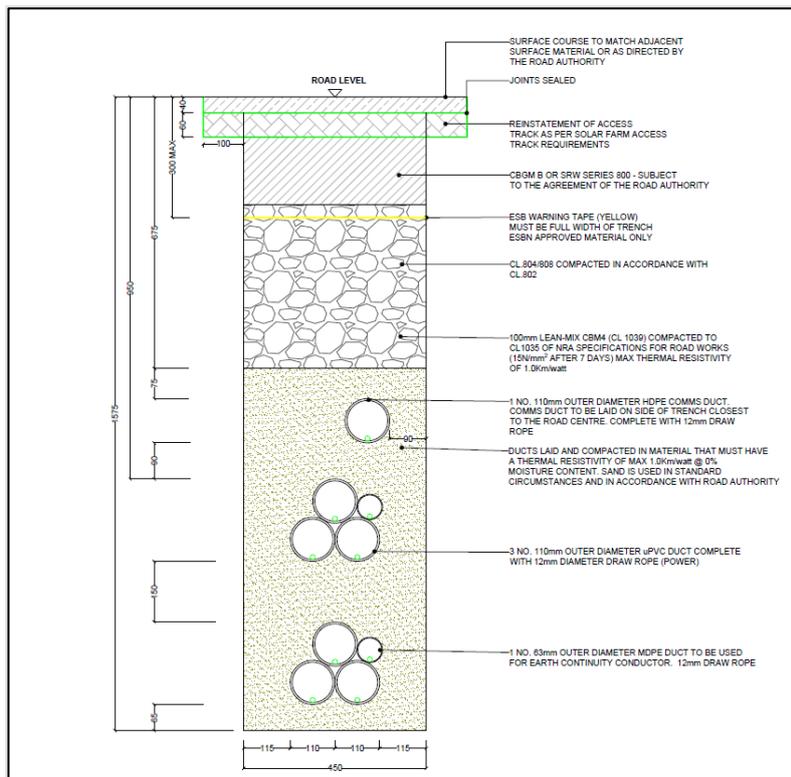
Stacked Double Circuit Trench Detail in Public Road
